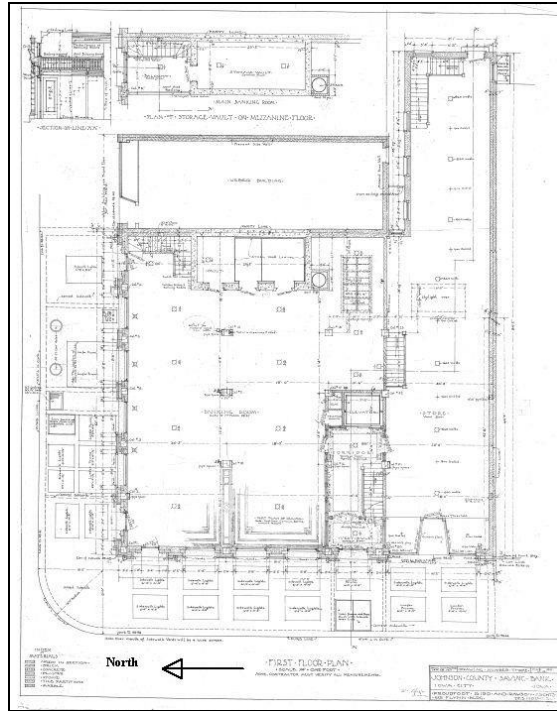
Original first floor plan, current plan (Proudfoot, Bird and Rawson, 1911)
